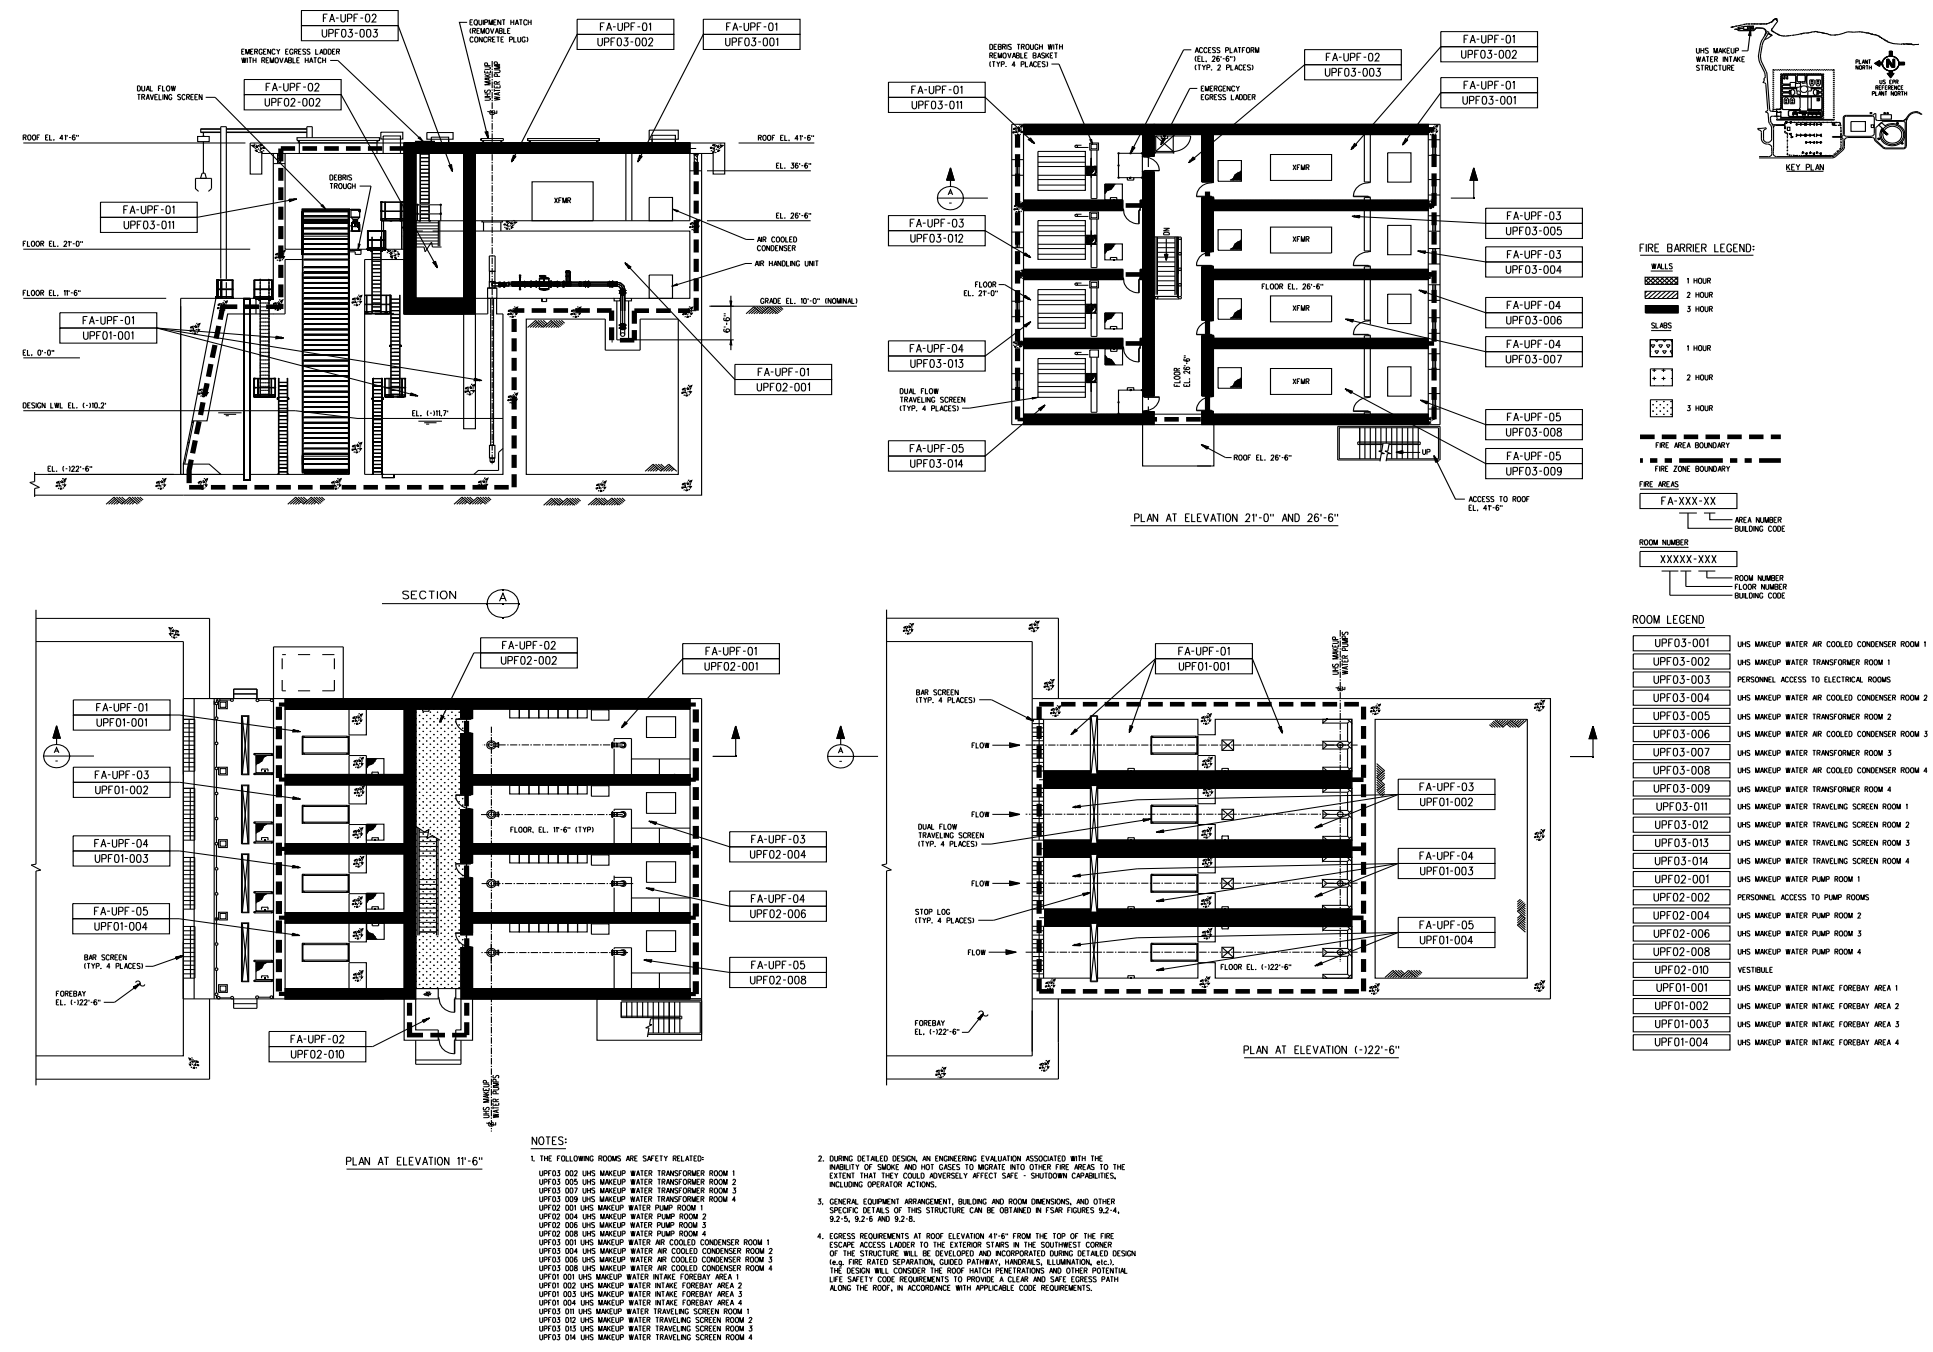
B-24 — CCNPP Unit 3 Fire Barrier Location, CW Makeup Intake Structure, Plan View and Section A-A
